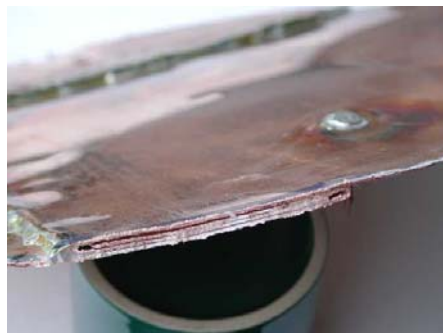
Section of the copper cladding (removed to fit the penetrations) showing the folded and soldered joining of the sheets and the soldering of one of the screw-heads to the copper sheet.
